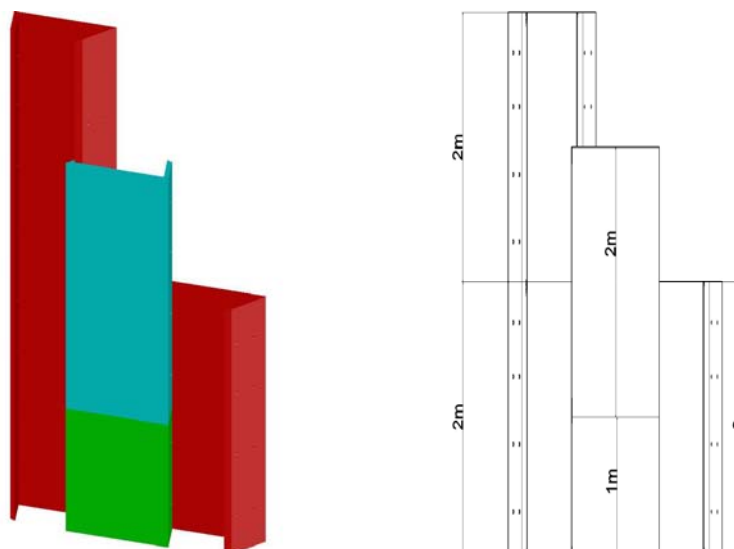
Proposed models for acoustic barriers made from rubberized concrete
